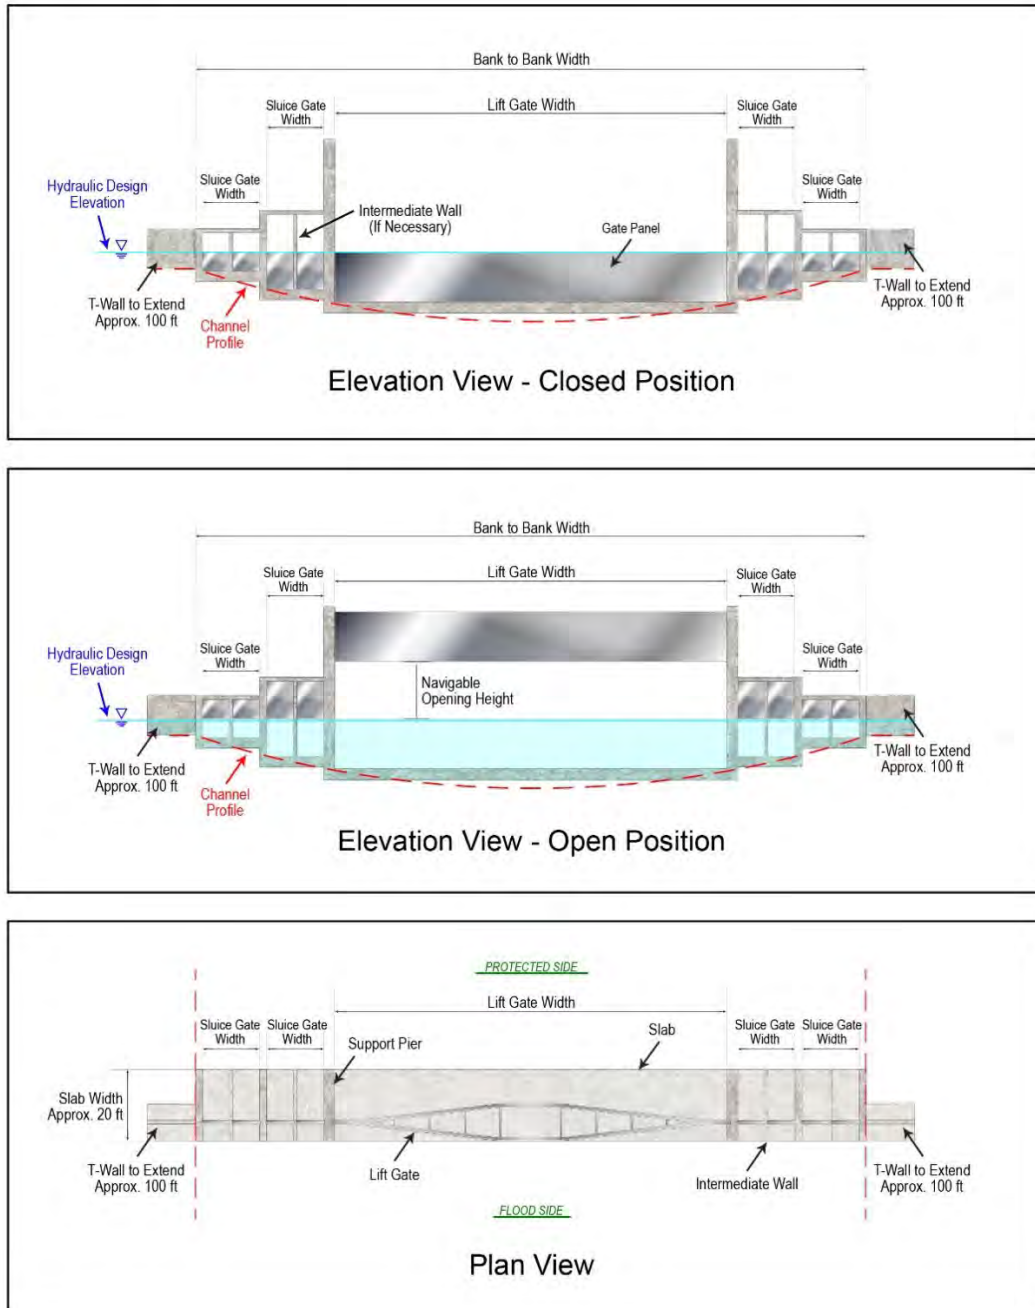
Typical Fish-Friendly Gate - Elevation and Plan Views
